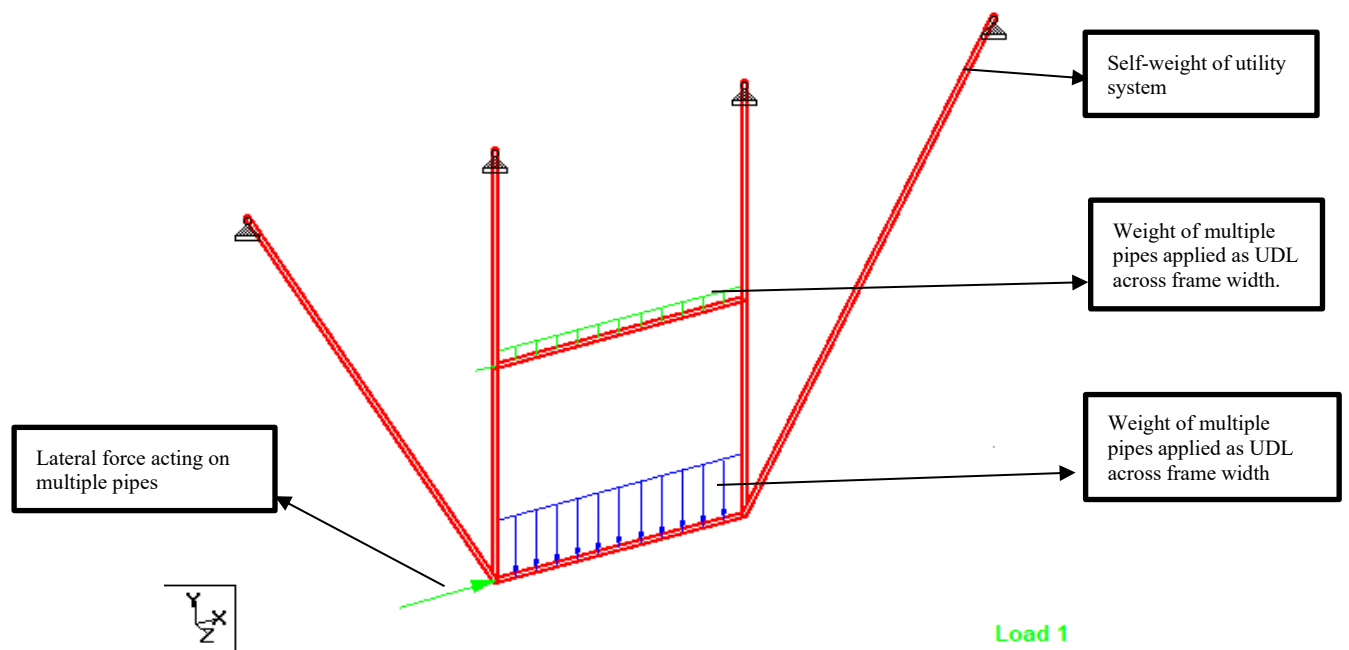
Forces acting on modular support system (Multiple pipe)
